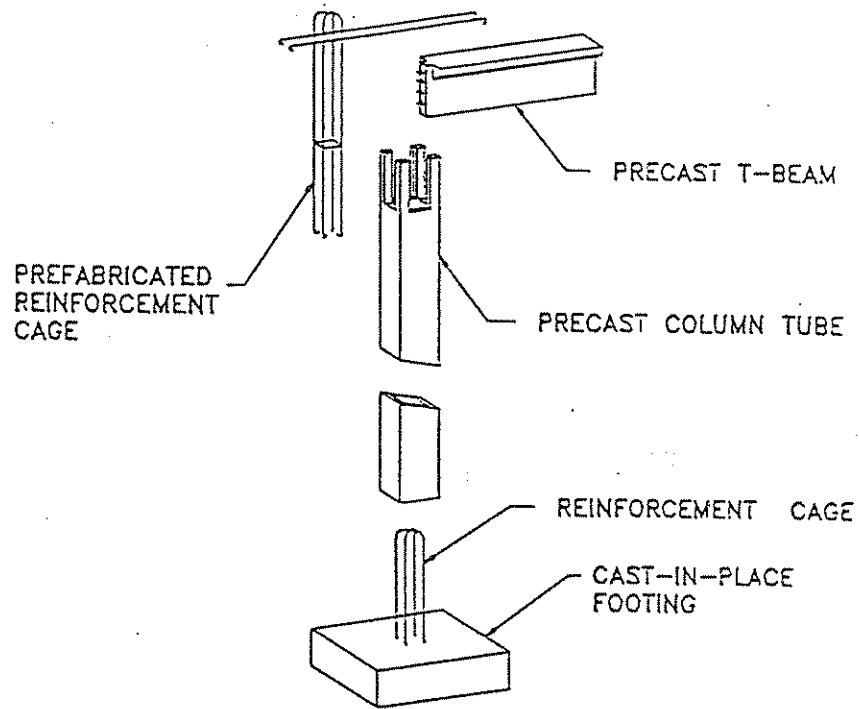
Footing-to-column and beam-to-column connection. Tongue of tee beam is dropped into slot of precast column.
